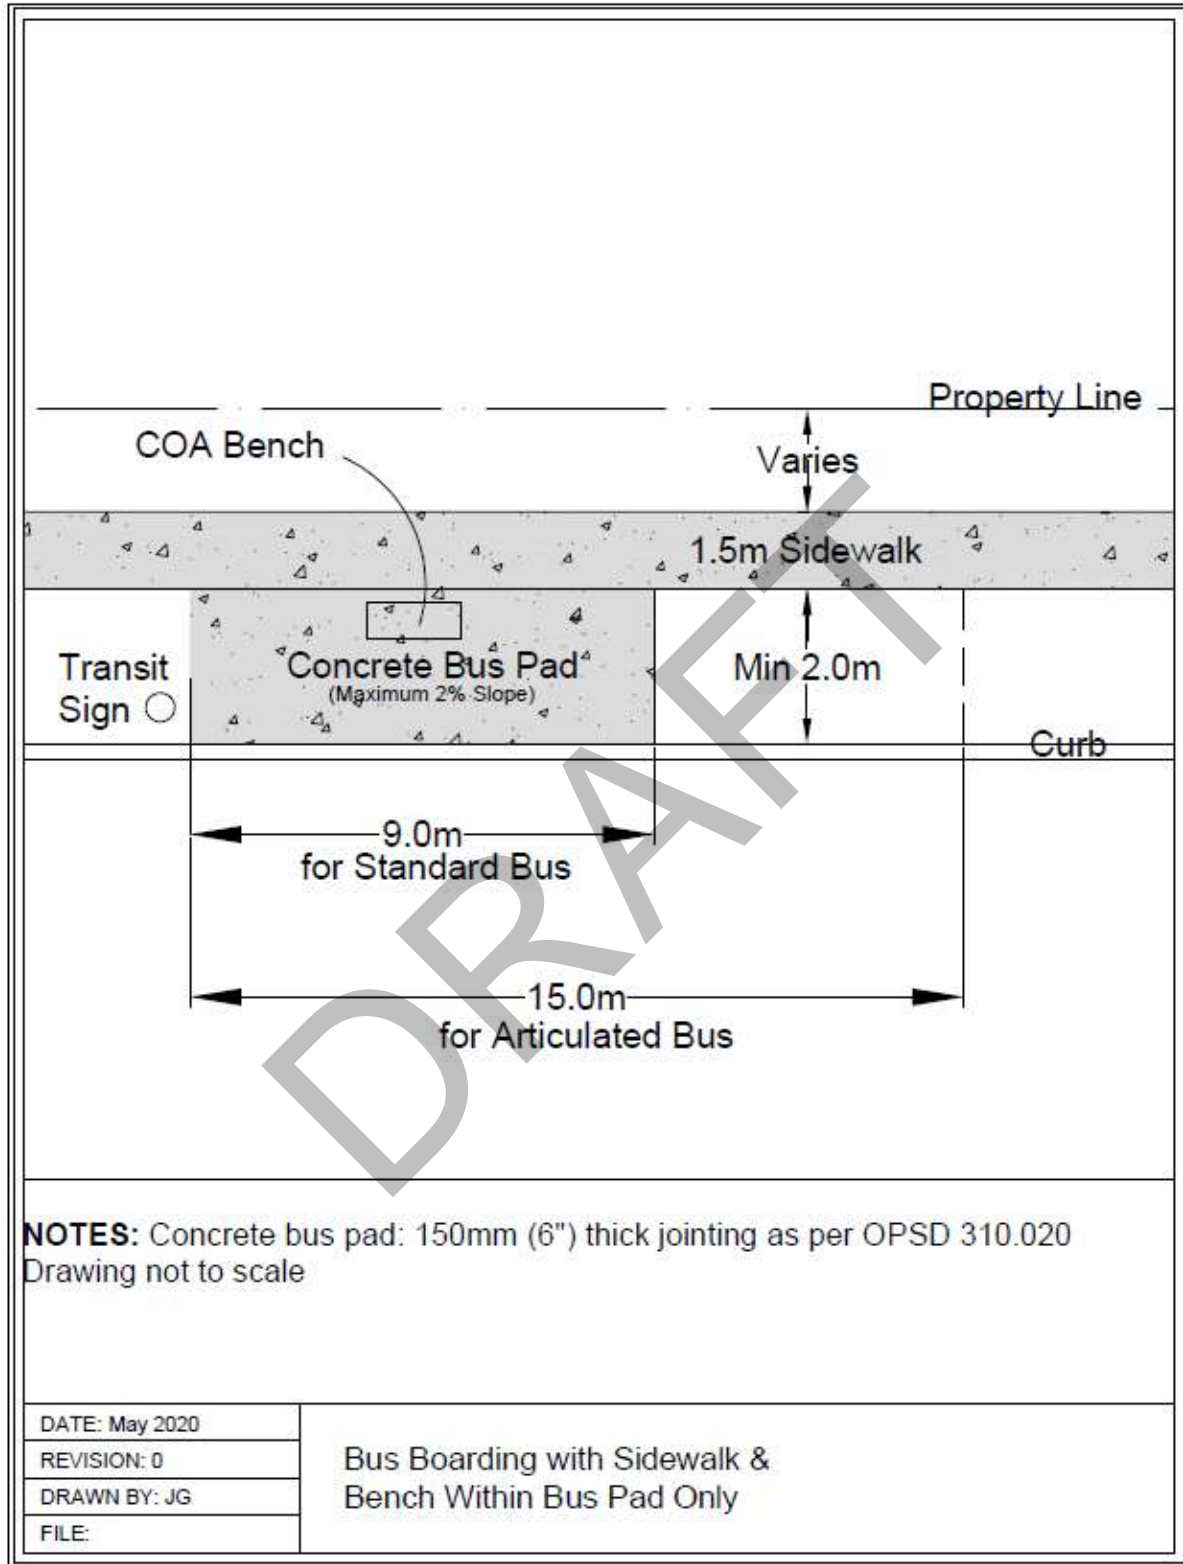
Diagram of bus boarding with sidewalk and bench within bus pad only.
